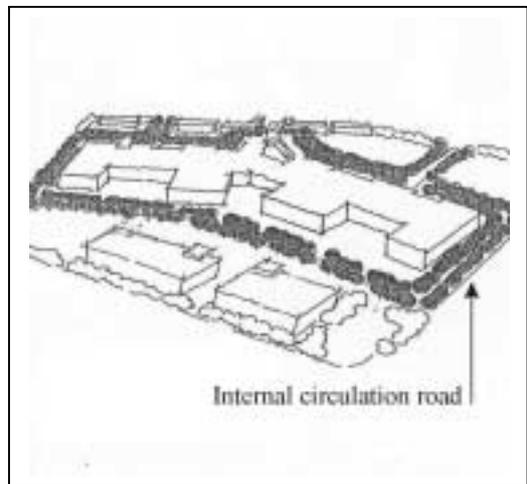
Acceptable. Features that create landmarks are encouraged.
